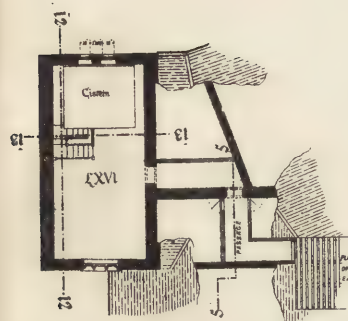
Plan of: Cistern: Room: & way on to Roof:
